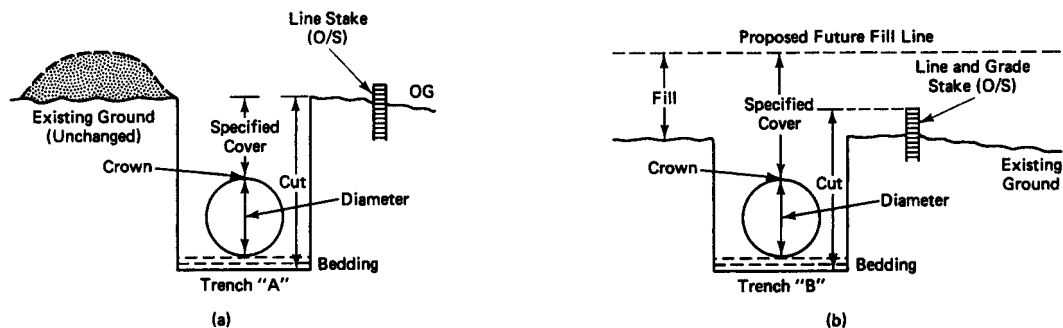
Pipeline construction. (a) Existing ground to be unchanged; (b) existing ground to be altered.
